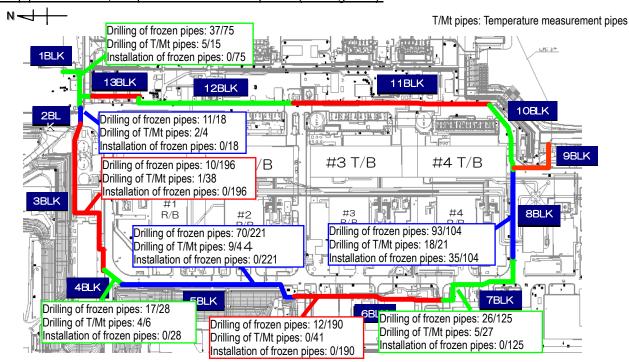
Status of drilling for frozen-soil impermeable walls and installation of frozen pipes
